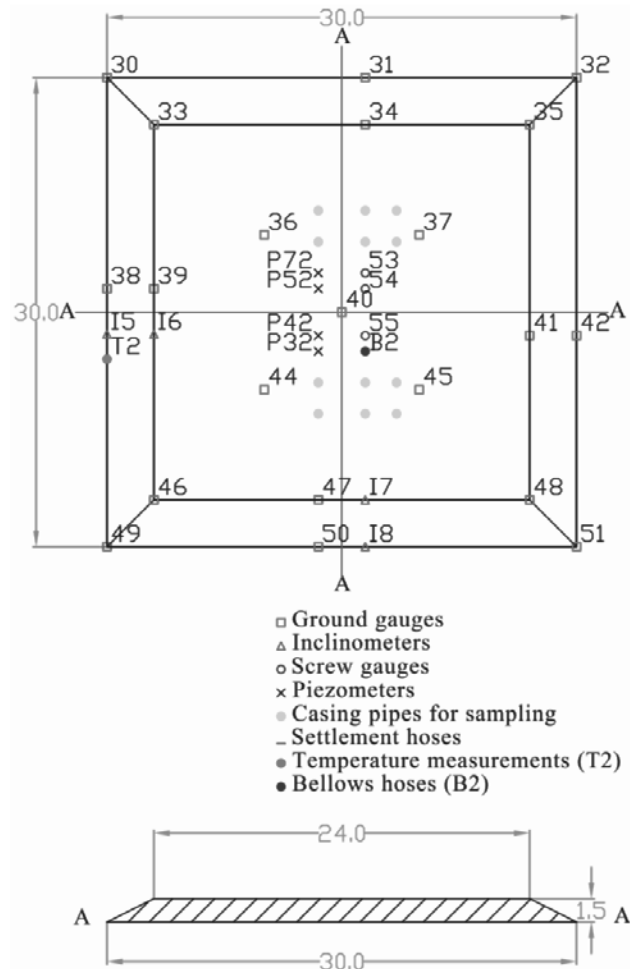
Plan of measuring equipment and cross-section of embankment 2 (in meters).
